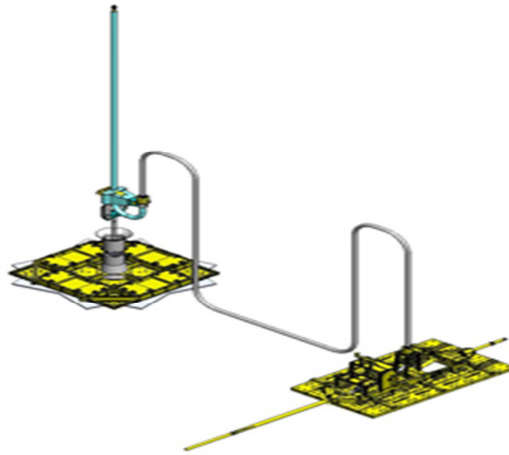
Typical subsea jumper system installation between a riser and a manifold (Patil, 2010).
